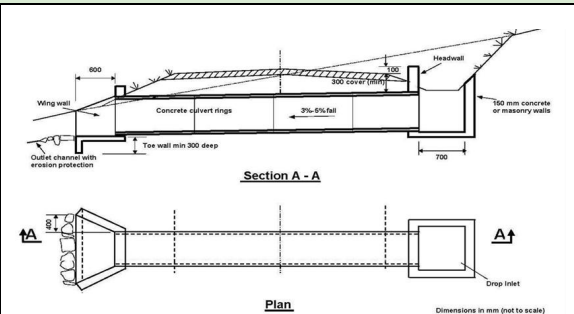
Cross-section and plan view of a standard concrete culvert installation
